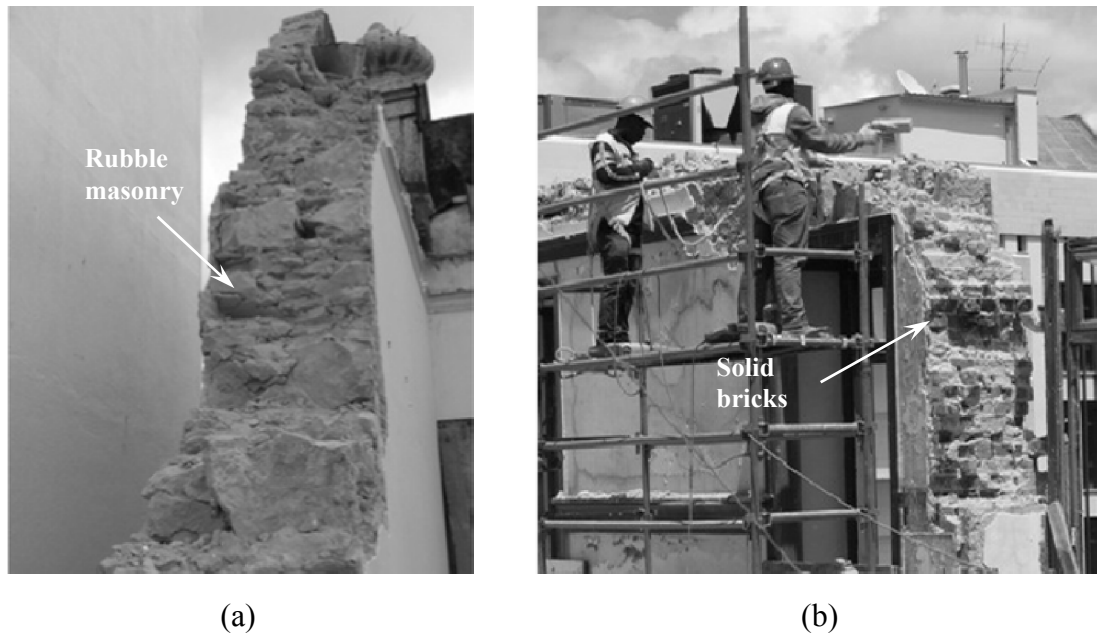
Walls of the “gaioleiro” buildings: (a) load-bearing wall with rubble masonry; (b) load-bearing wall with solids bricks (adapted from Andrade 2011).
